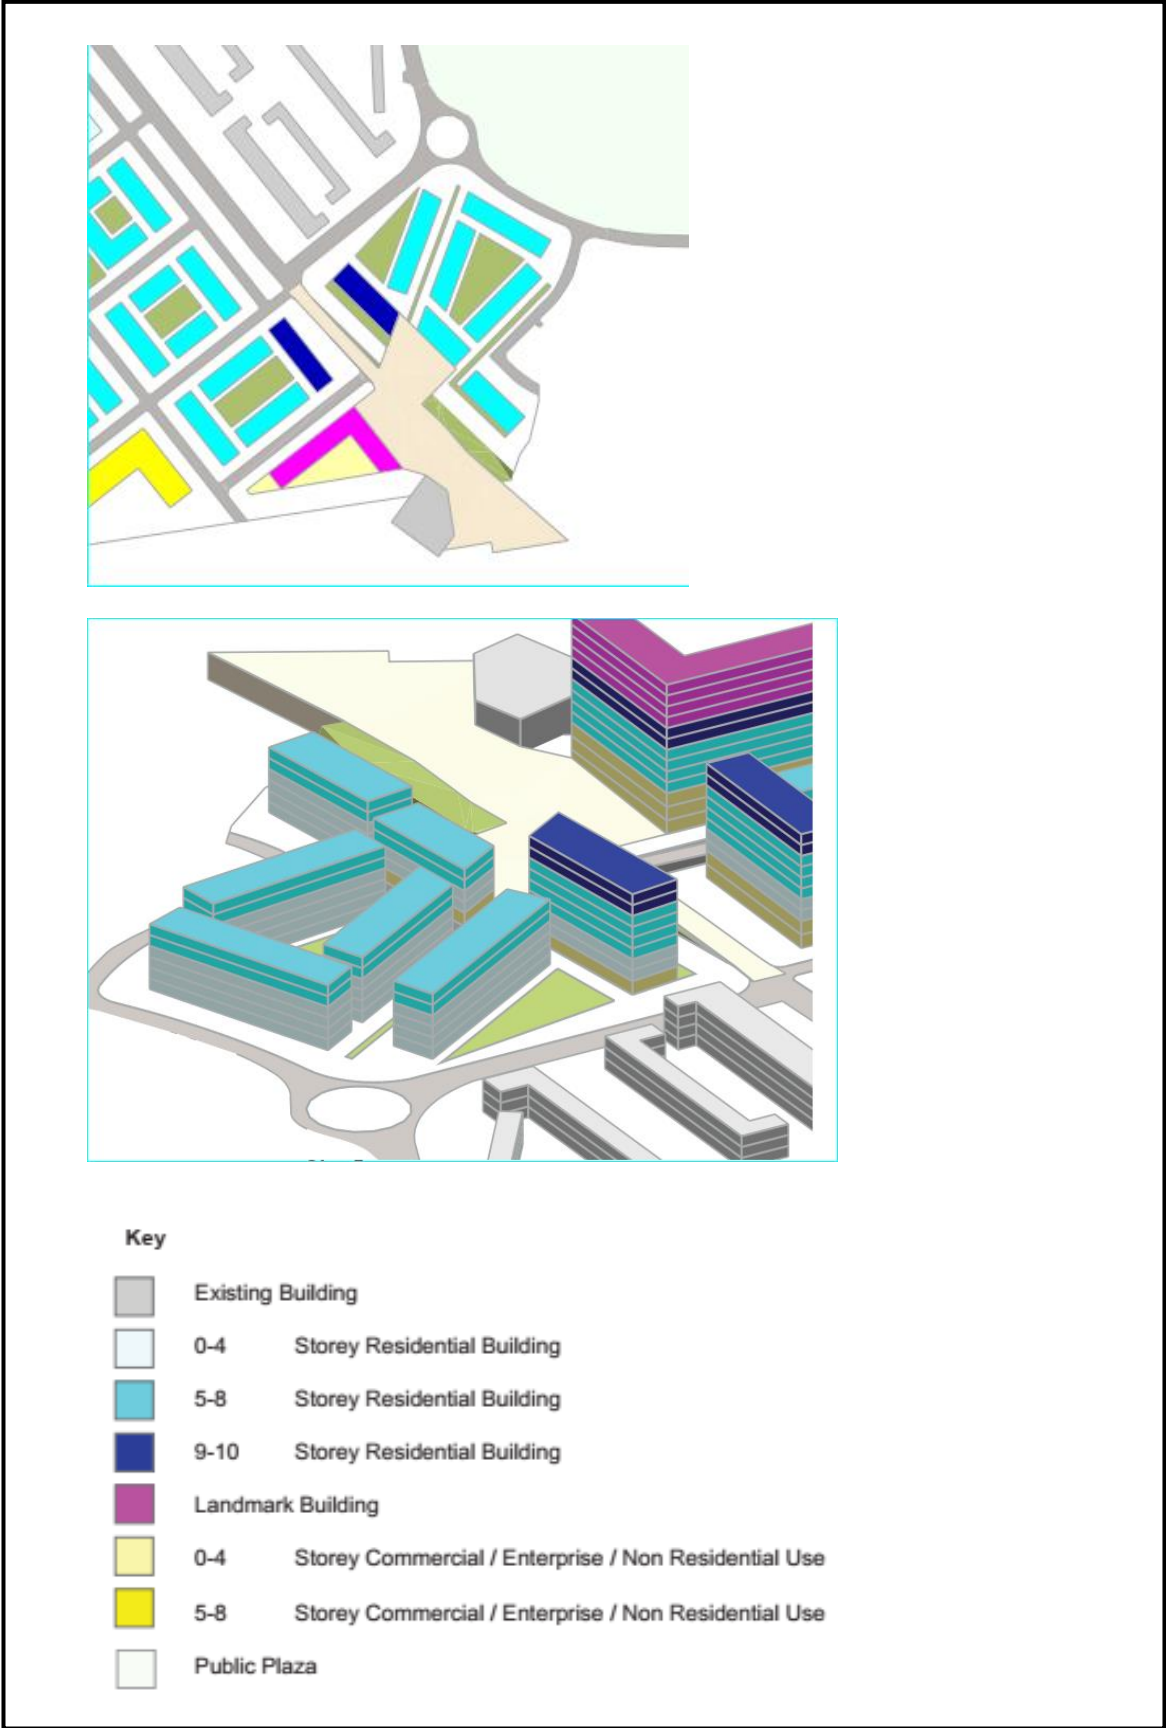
LAP Indicative Layout and Massing for Site No. 5
